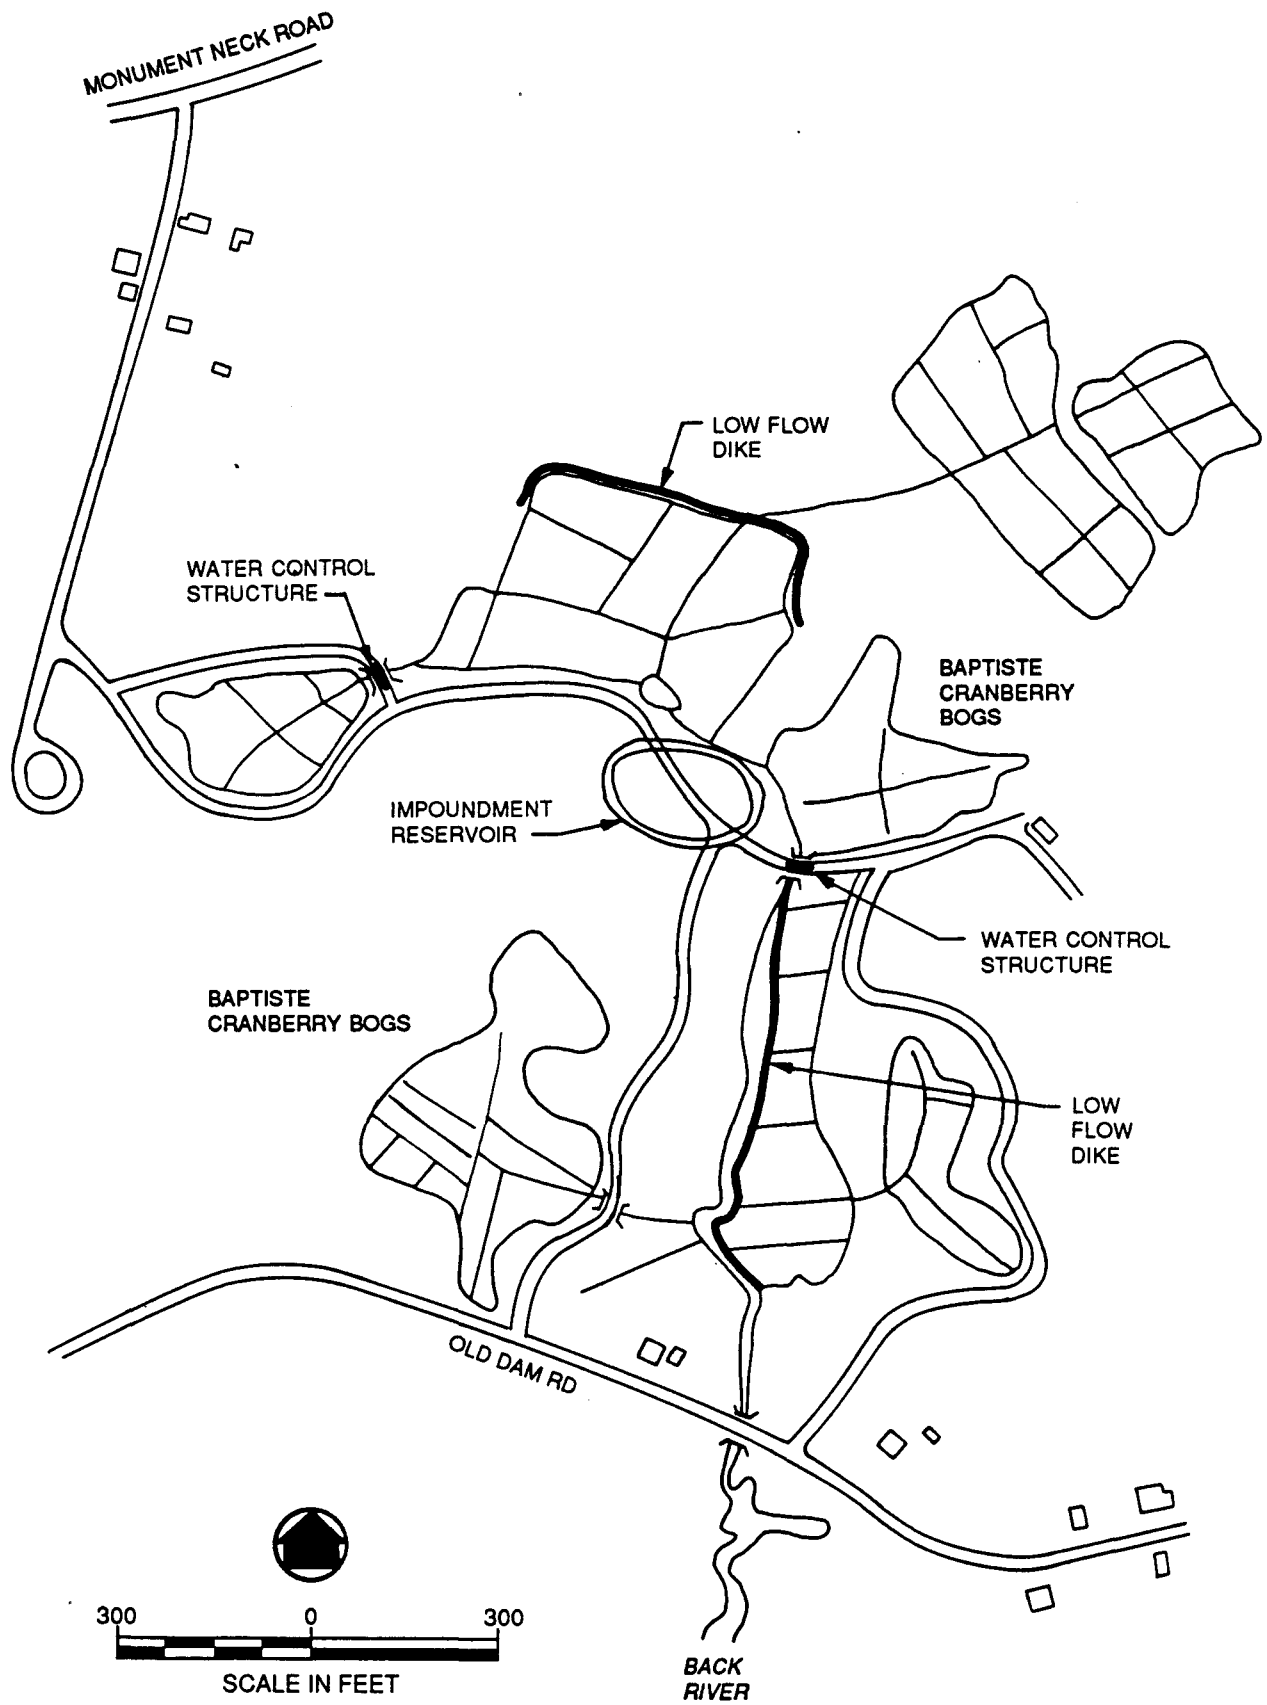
BAPTISTE CRANBERRY BOGS SCHEMATIC RECOMMENDED PLAN
